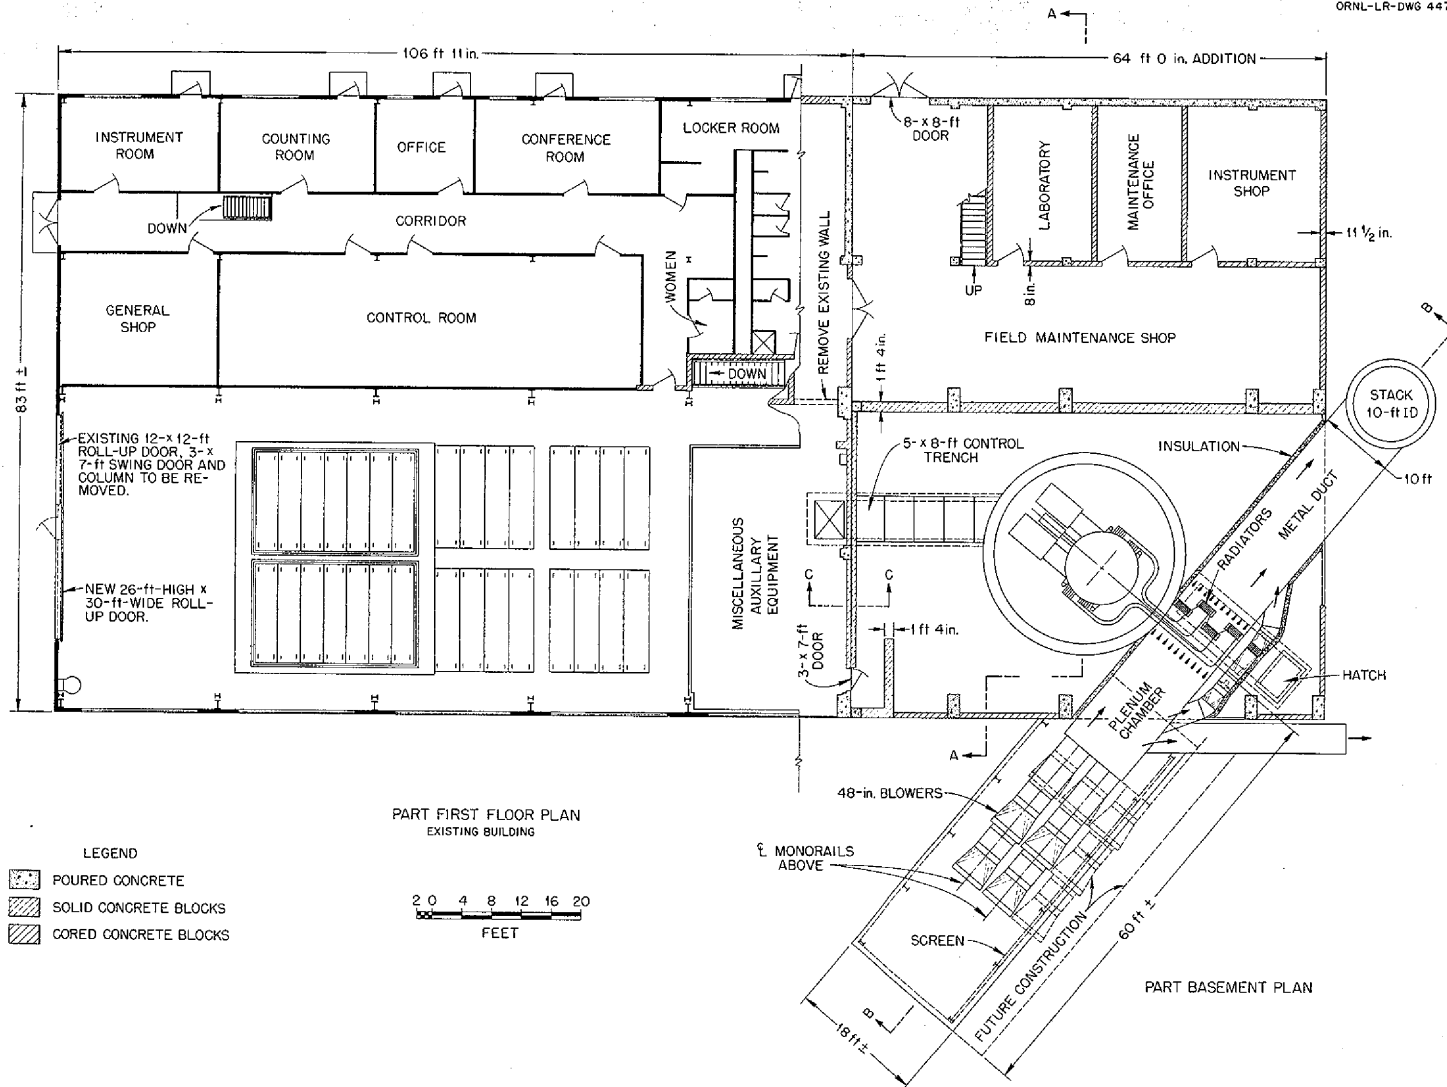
Layout Plan of Proposed ART Installation in Addition to Present ARE Building.
